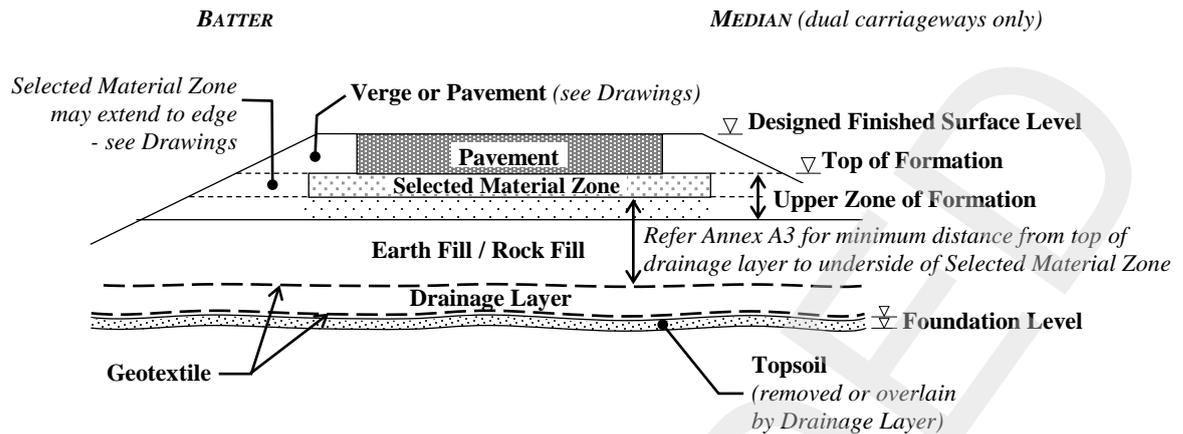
(e) – Embankment Foundation Treatment Type E5 – Drainage Layer
